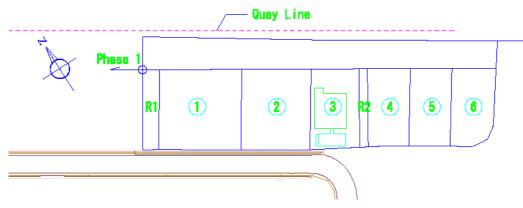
(1) Land section plan prepared by Government of Seychelles
